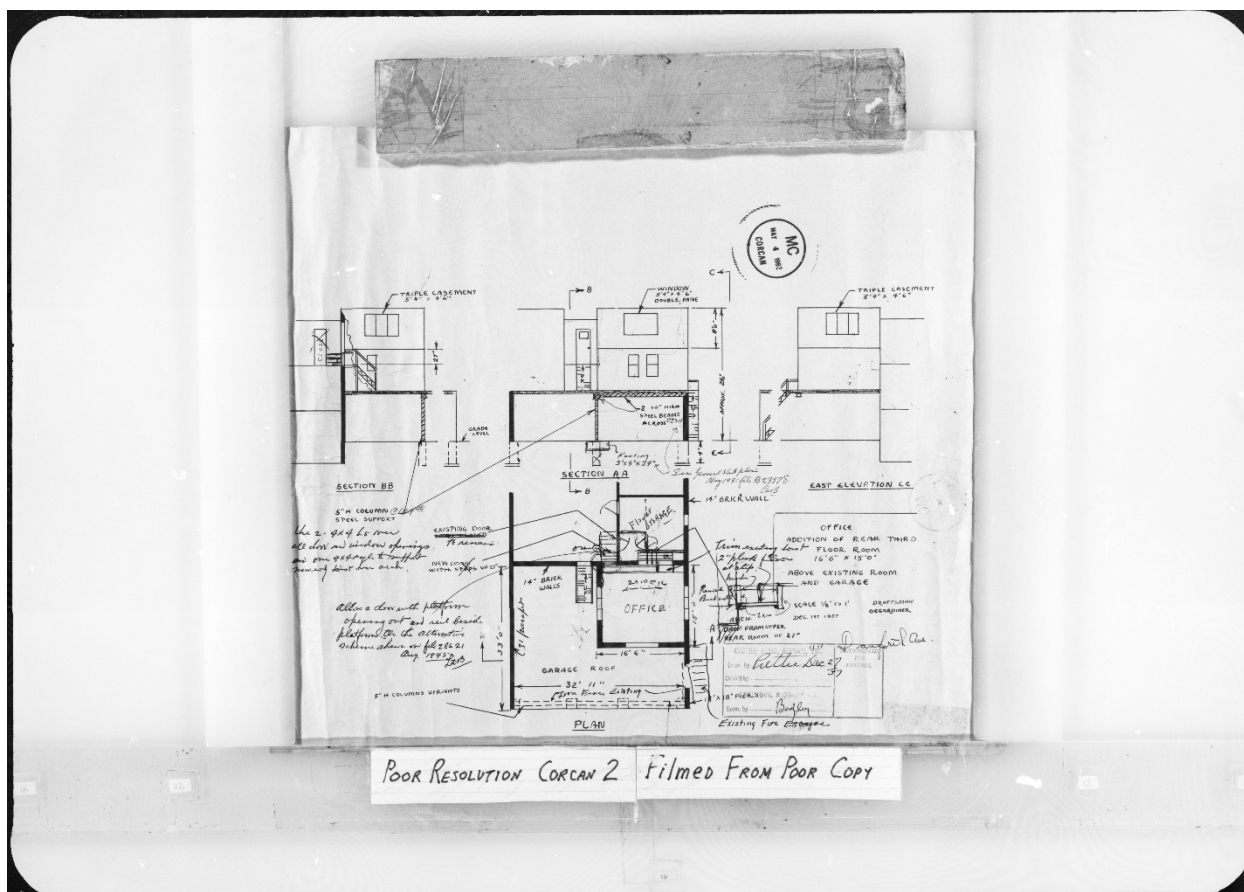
Excerpt from Building Records showing the proposed 1957 addition to the rear of the office building above the garage (Archival Building Records, 1957)
